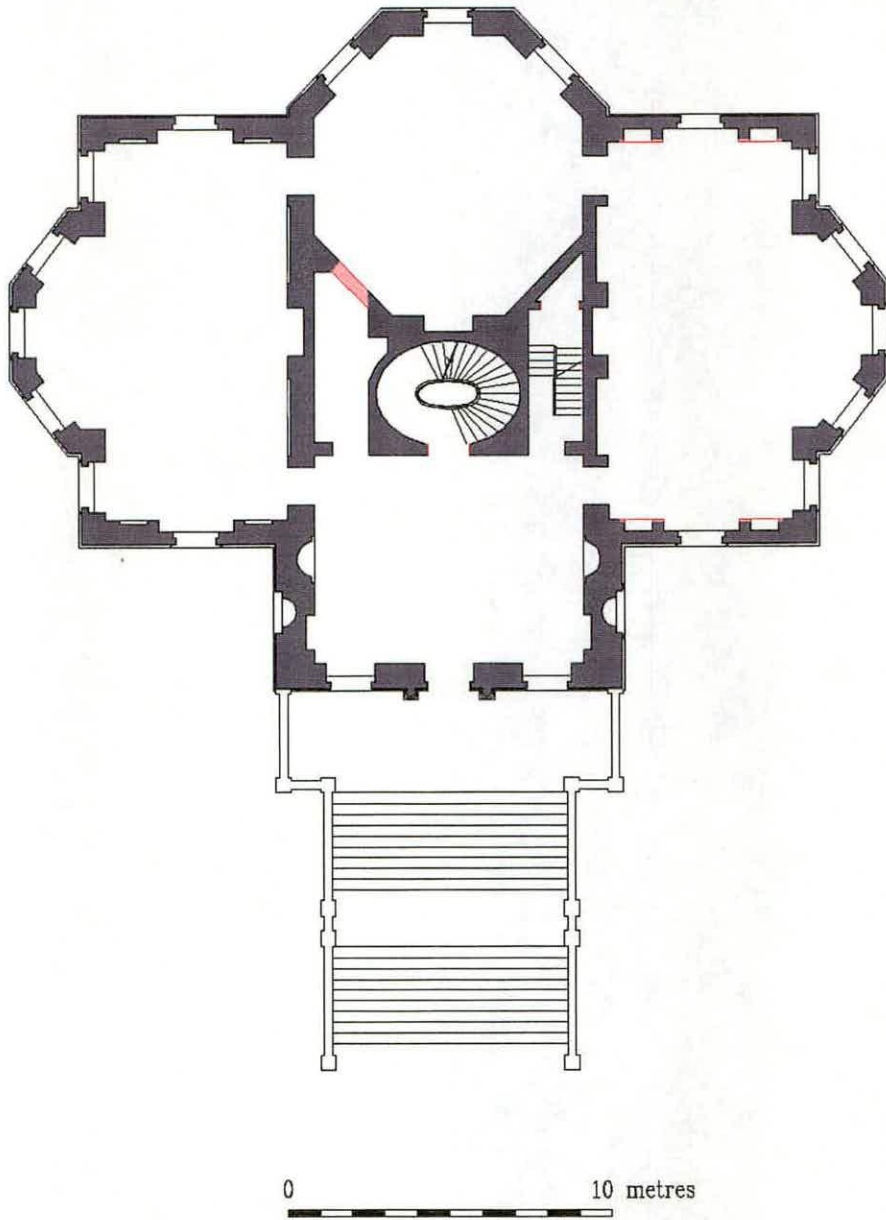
, a reconstruction plan of the principal floor as it might have appeared in 1763 before fitting out.
